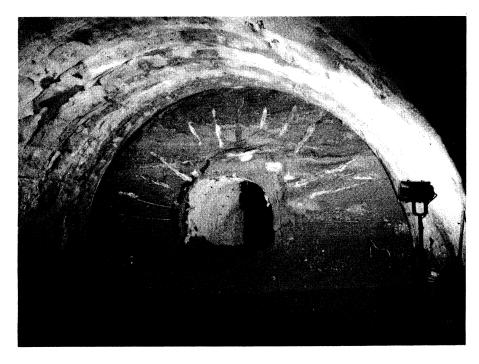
View of pilot and full bore, showing end of jet grout columns and radial tubes à manchette. Milano Metro Line 3.
